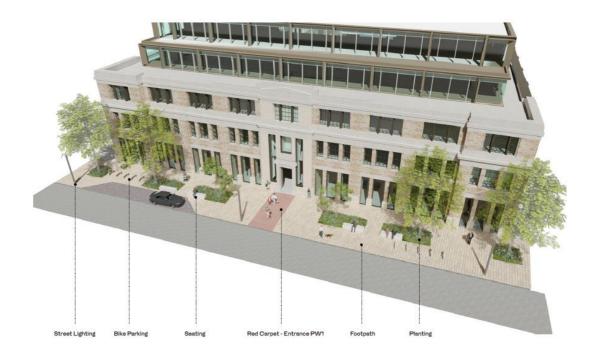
PUBLIC REALM IMPROVEMENTS, SOUTH CIRCULAR ROAD
